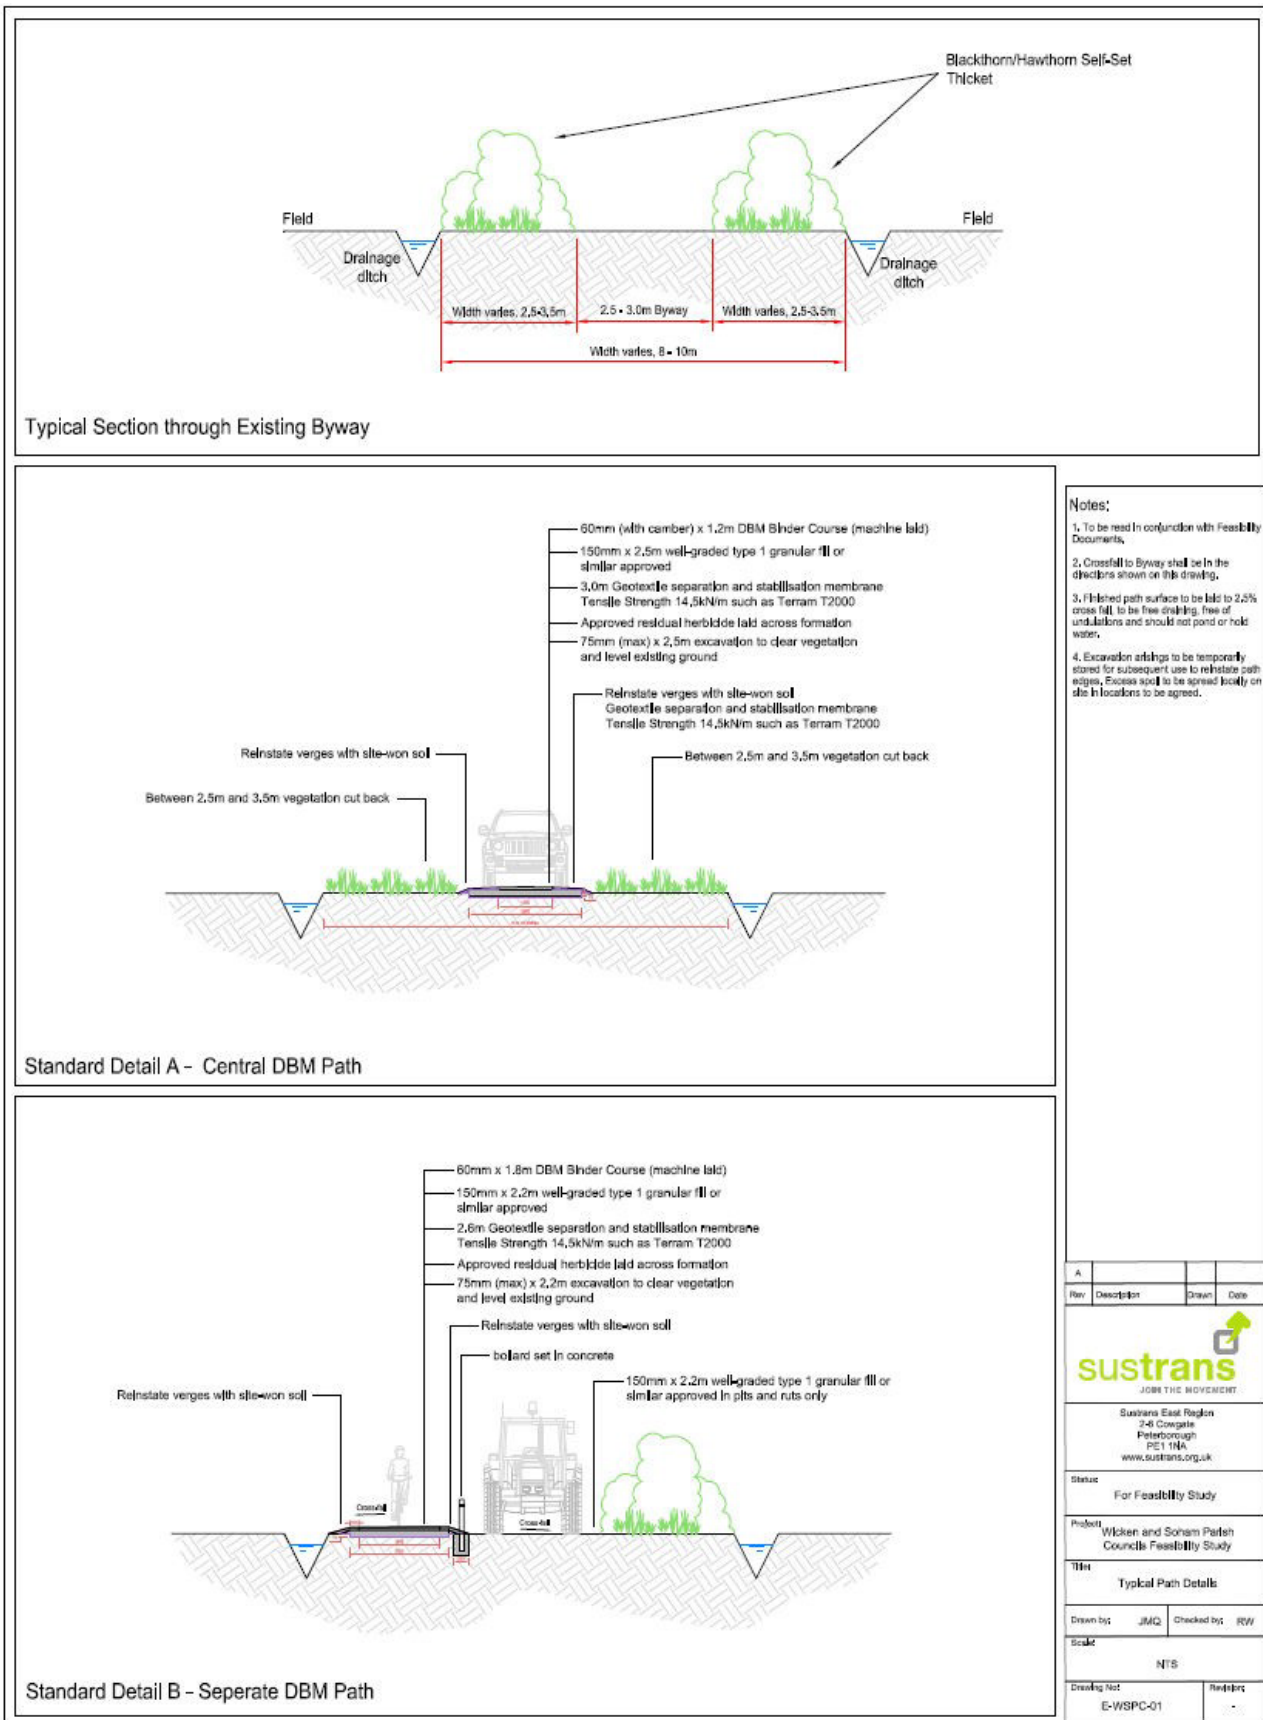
Typical section of Brack's Drive, existing and with proposed path, options A and B
